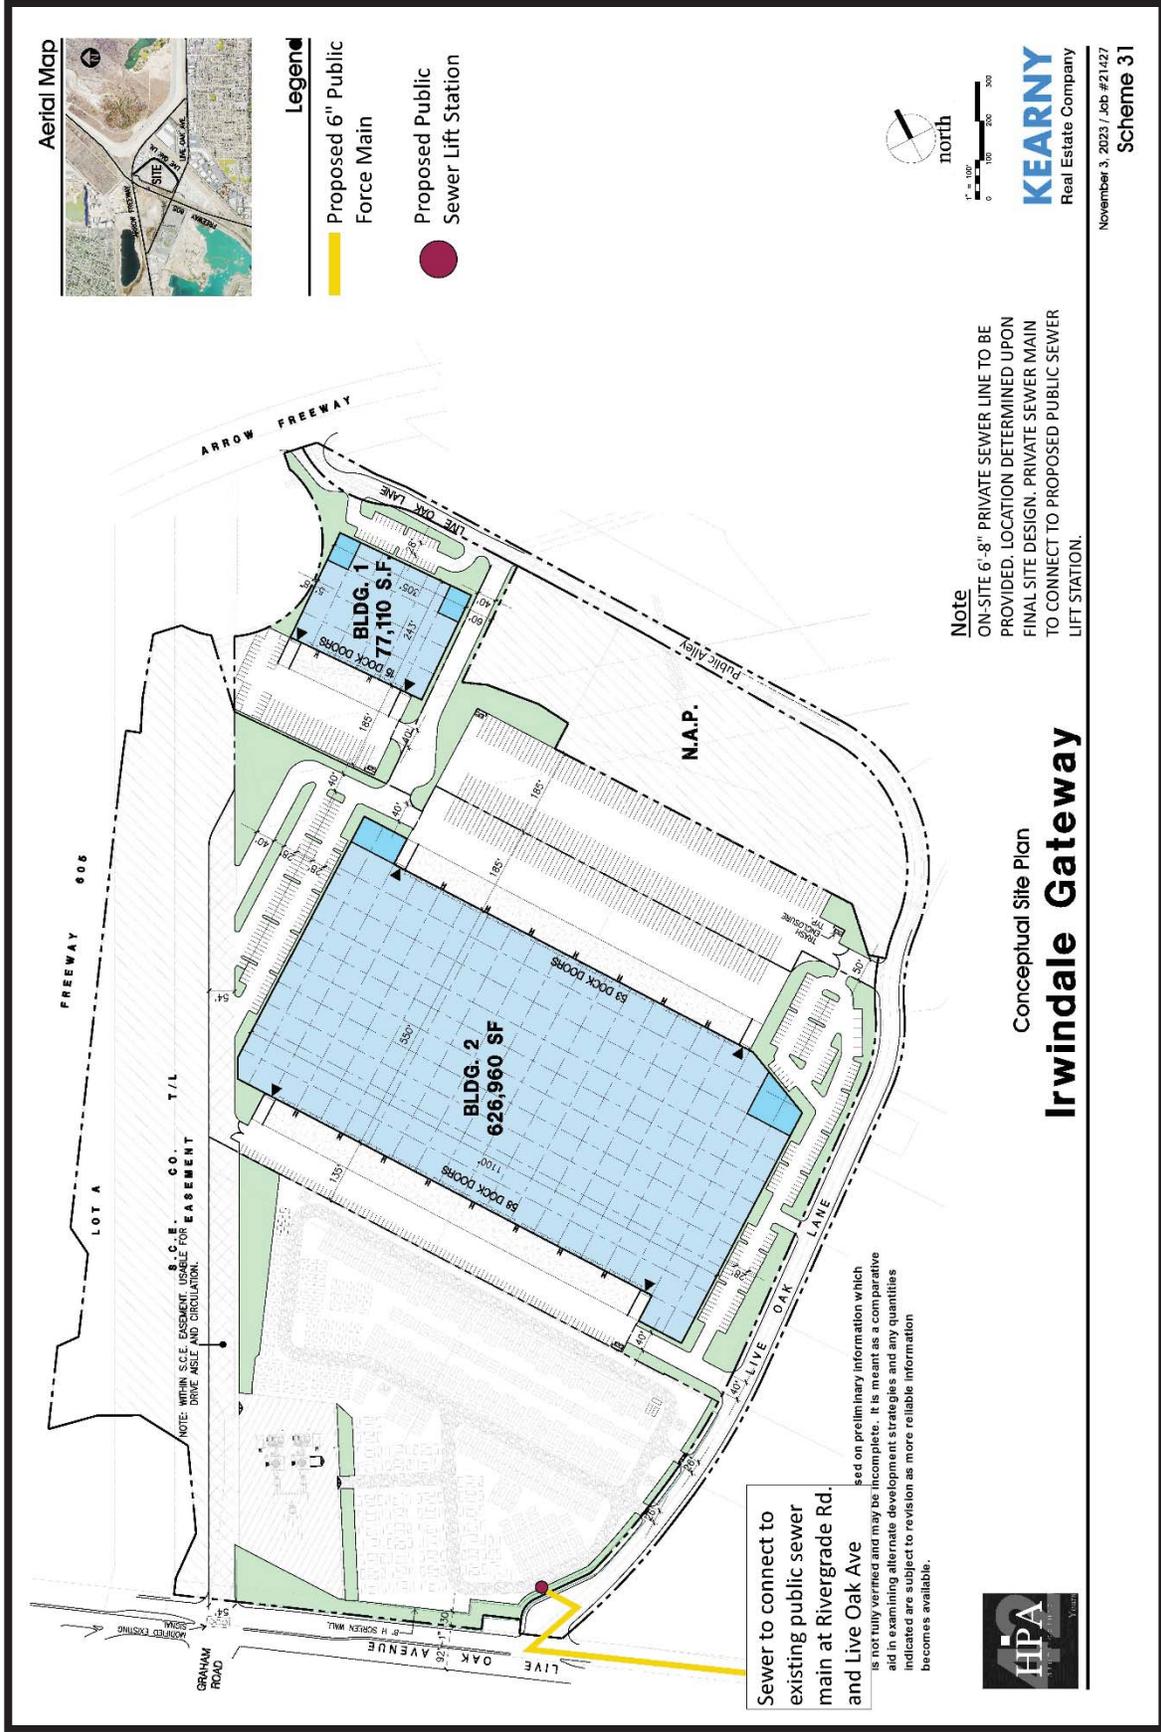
CONCEPTUAL SEWER PLAN WITH BSS
